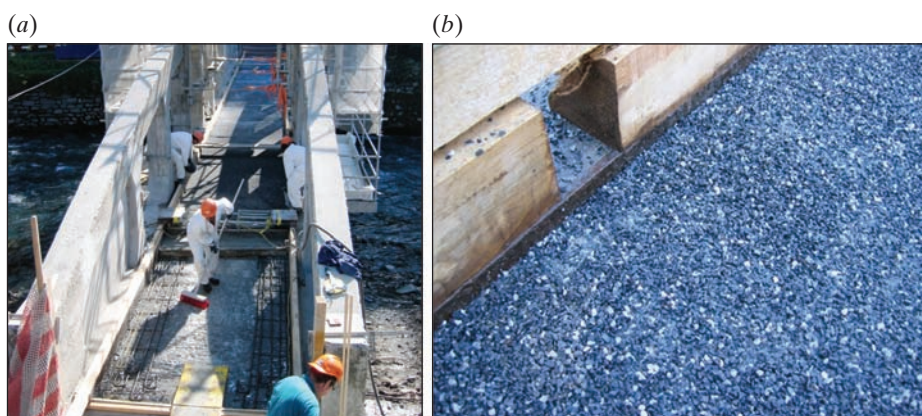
(a) Rehabilitation and strengthening of a bridge deck slab with reinforced UHPFRC; (b) drivable UHPFRC surface
